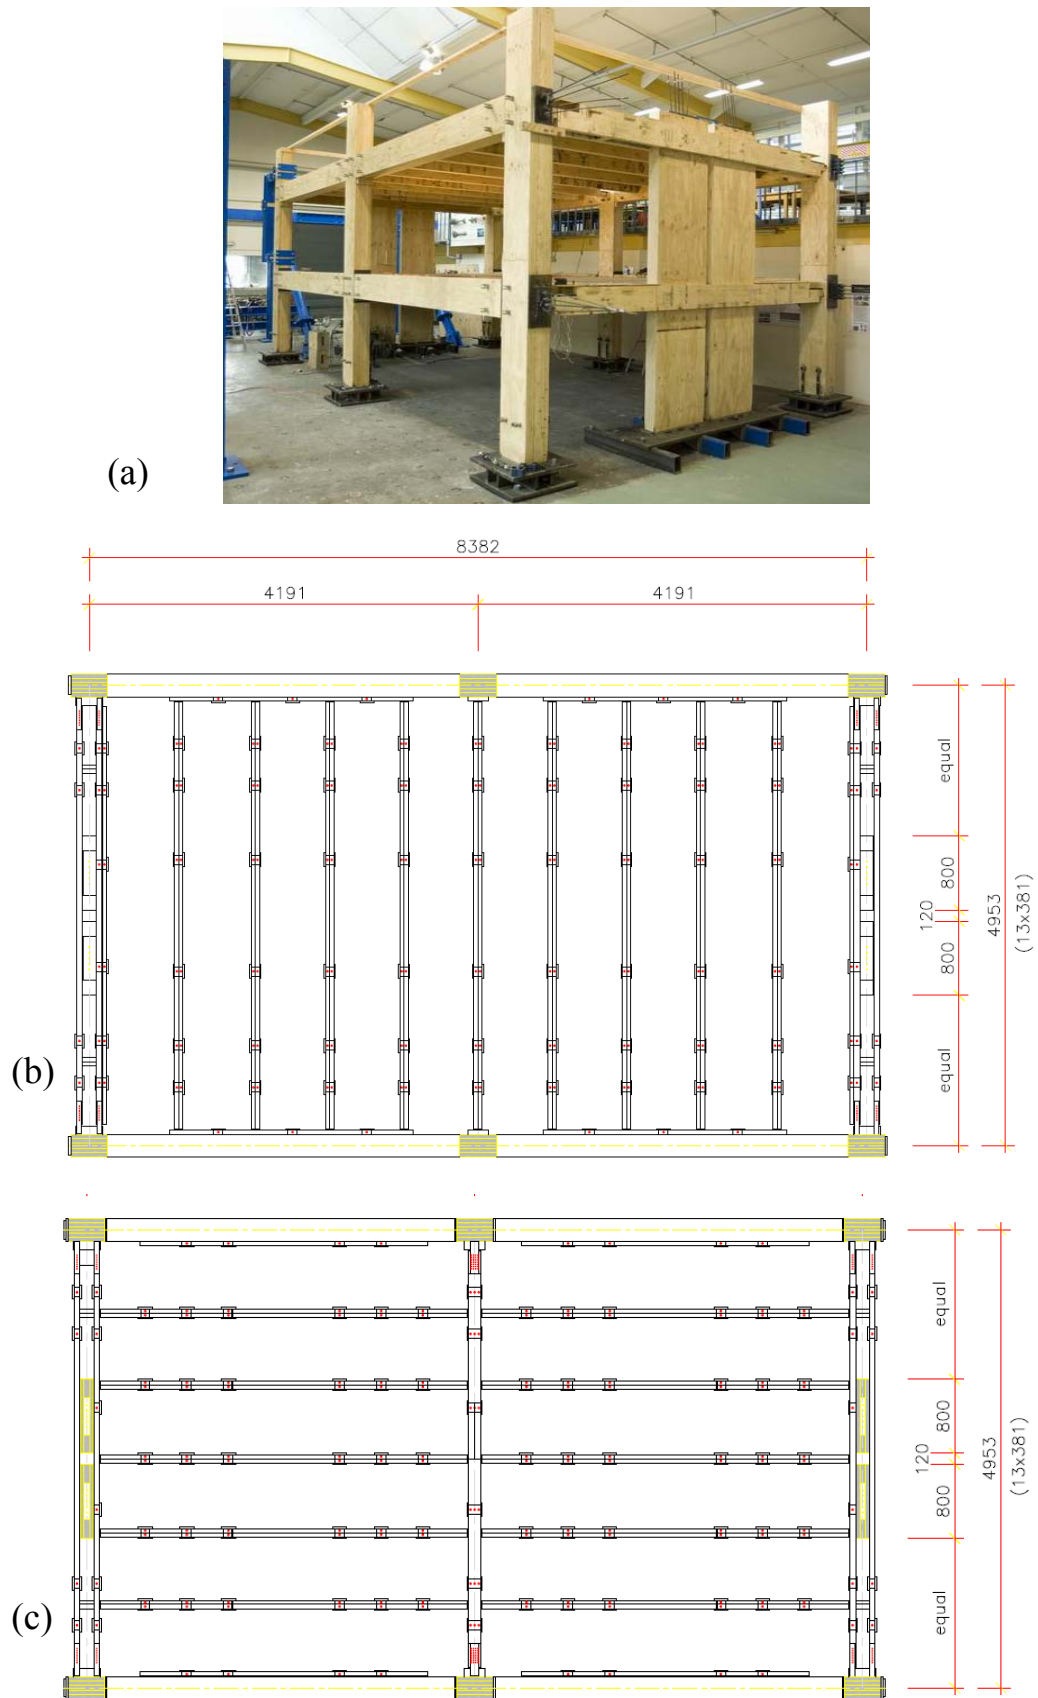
Experimental post-tensioned timber building 3-D view in (a), floor plan of level 2 and 3 in (b) and (c), respectively.
